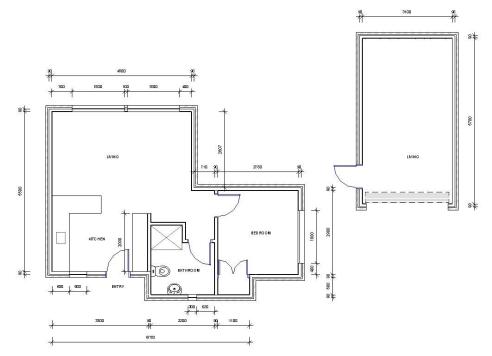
Floor Plan of Block G and H -of Unit 2 and Unit Garage.
